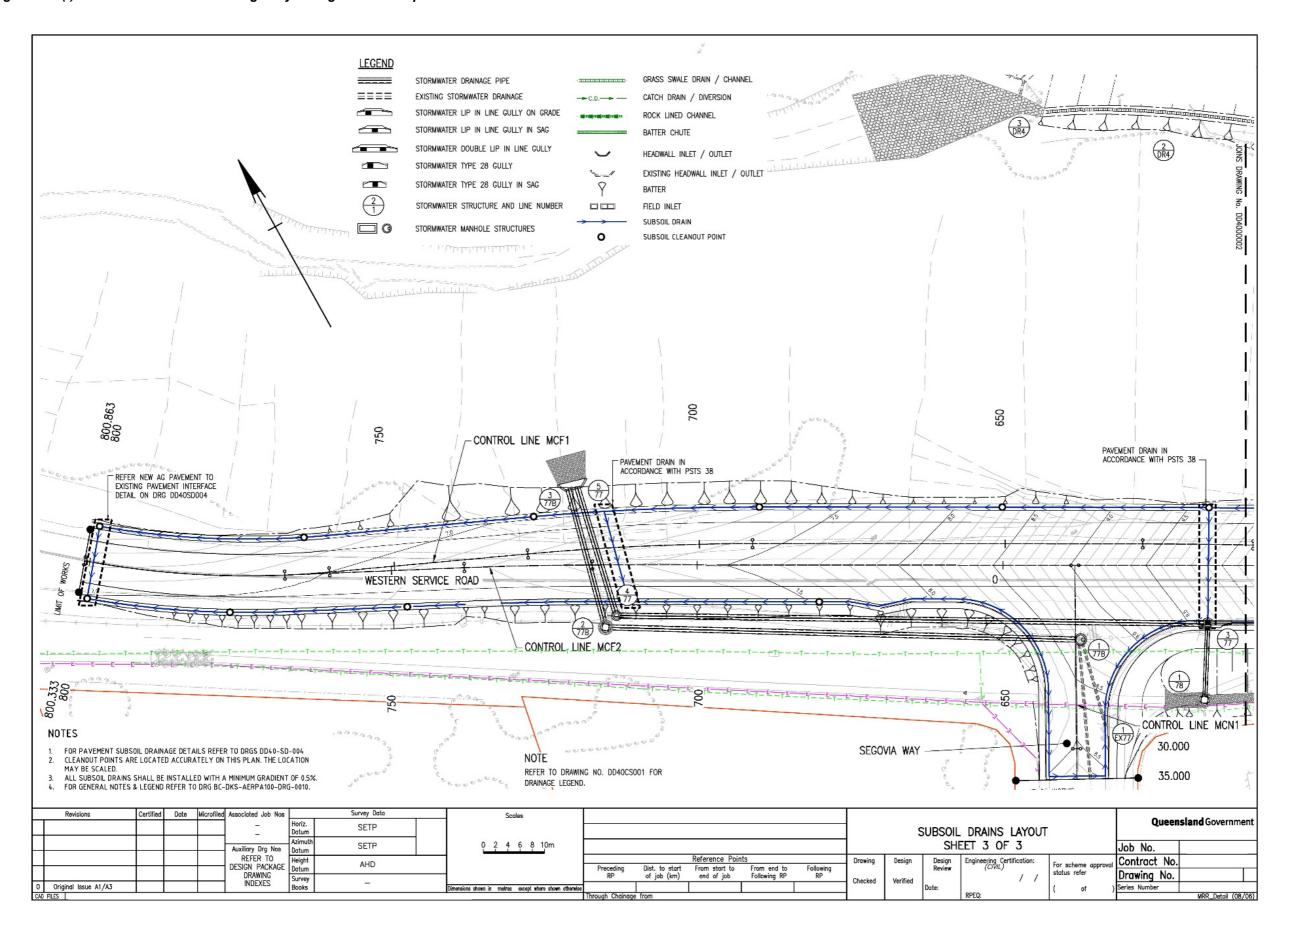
(g) – Pavement Subsoil Drains Details – generic example
